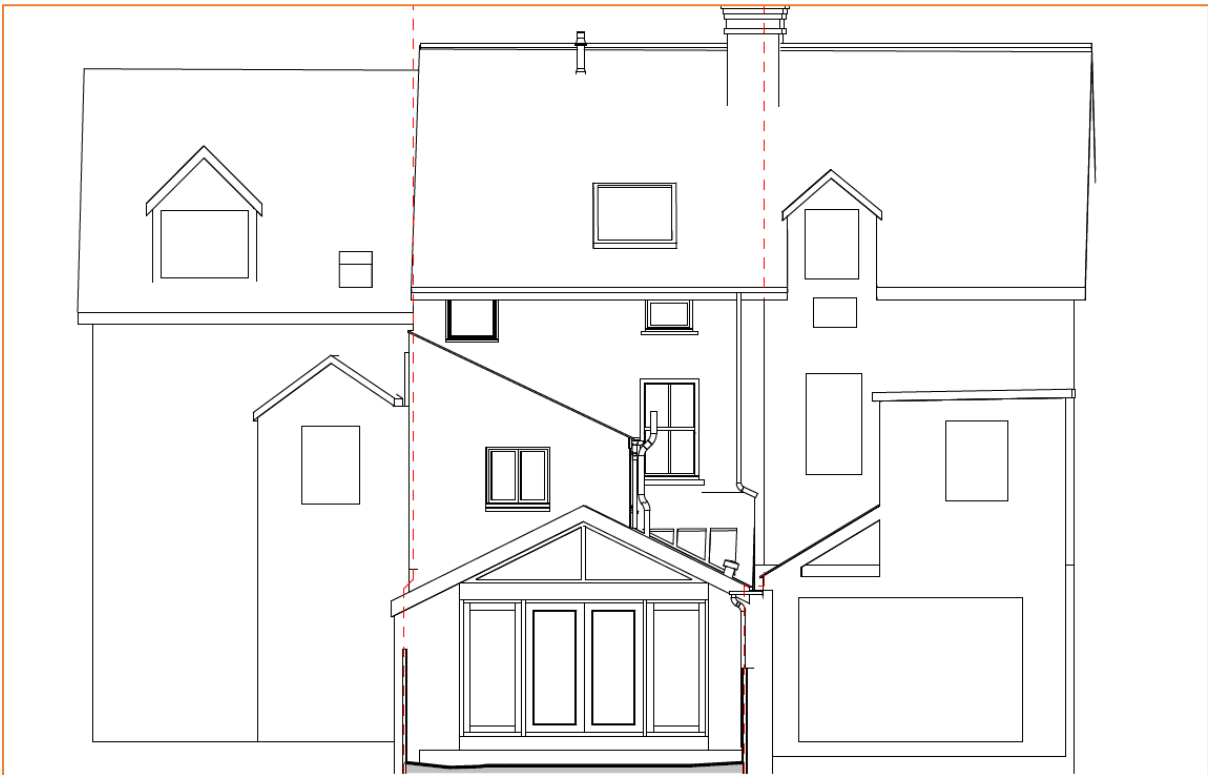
Existing Rear Elevation (Source: Gresford Architects)
